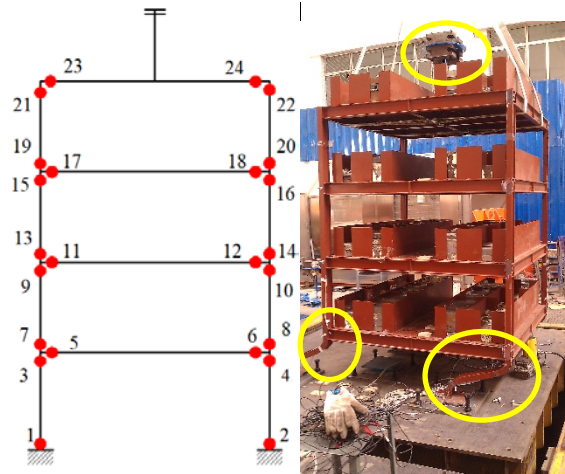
Fiber element modeling and collapse failure scenario of the tested specimens
